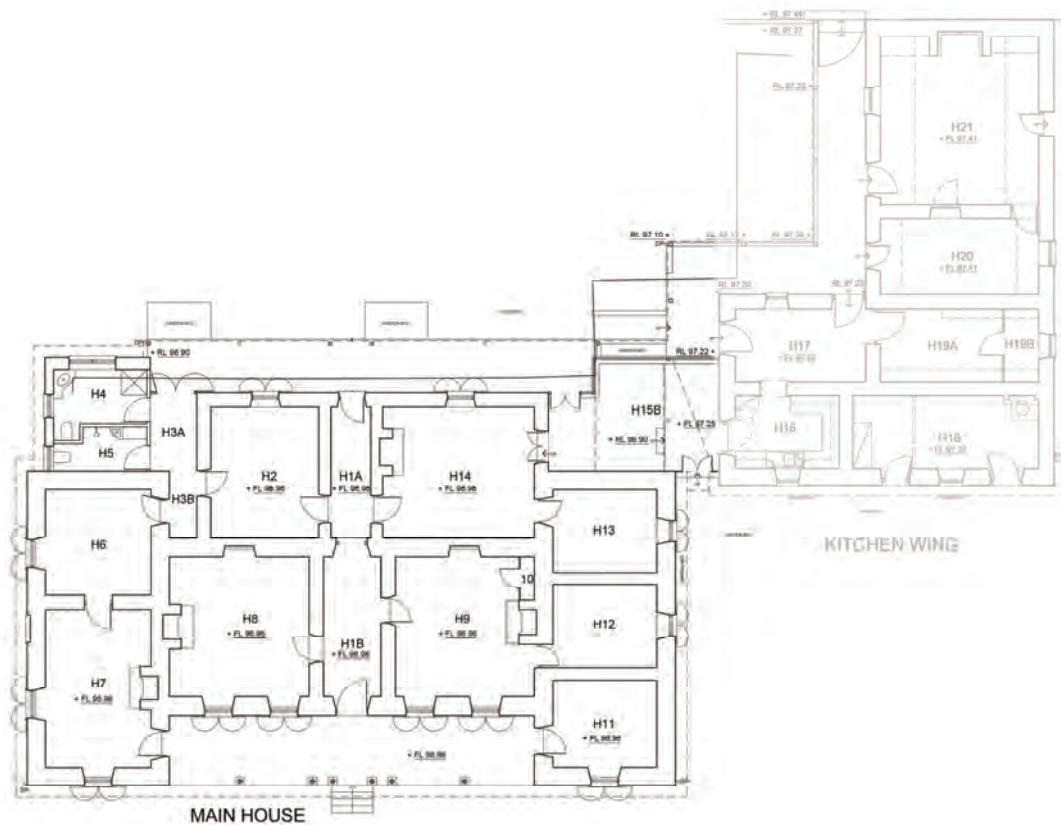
162: Measured floor plan of the Main House. Source: LSJ Architects
